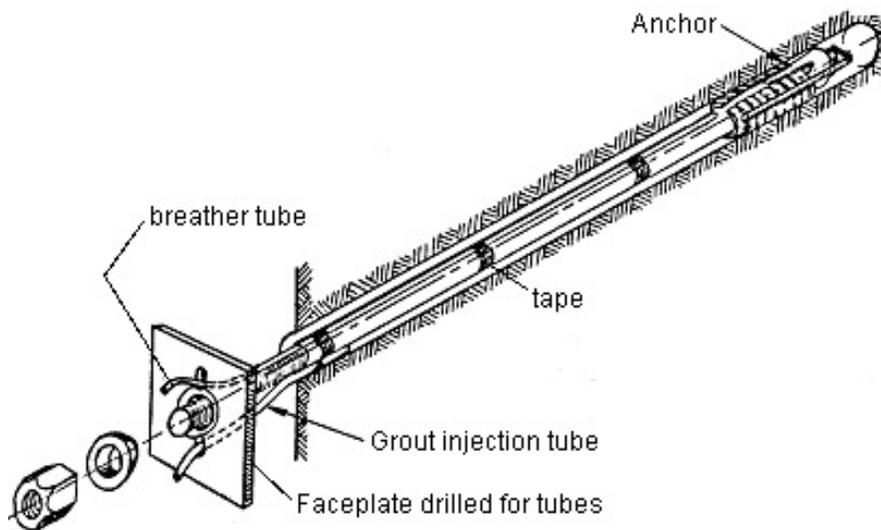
Mechanically anchored rockbolts of the type used on the Rio Grande project. These bolts were tensioned to 70% of their yield load upon installation and then, at a later stage, were re-tensioned and fully grouted.
